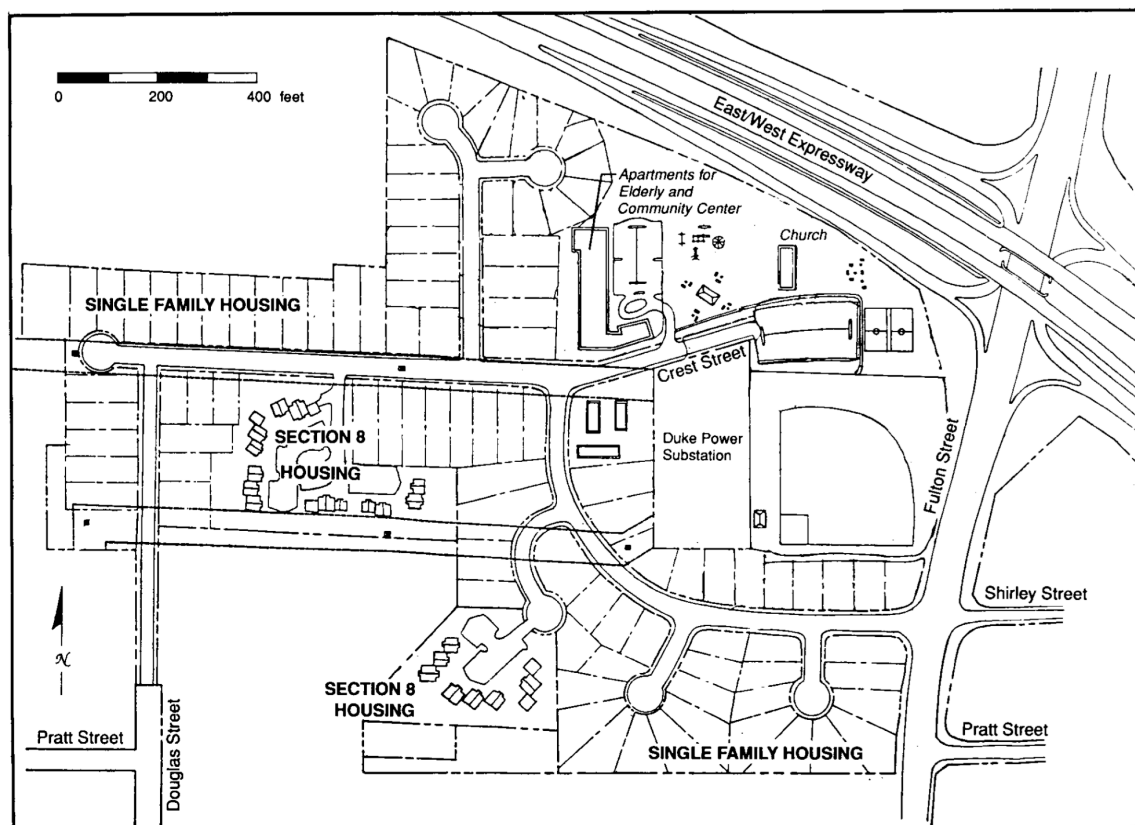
North Carolina Department of Transportation site plan for the new Crest Street community.
